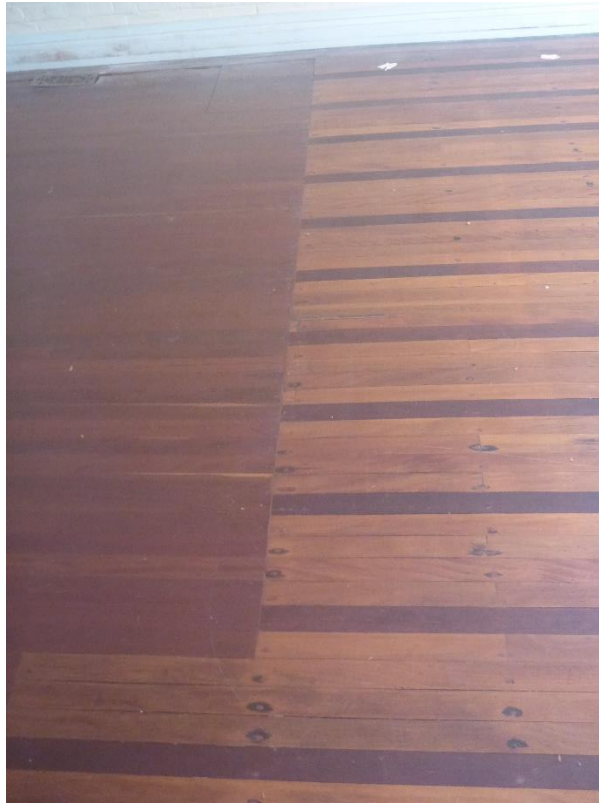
Another detailed view of the intersection between the polychromatic and banded timber flooring of the public areas within the banking chamber and the more generic timber flooring that was installed behind the line of the banking counter. (Source: VAULT)
